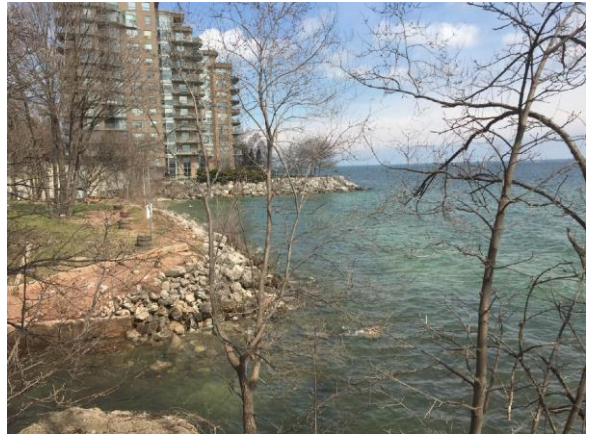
Reinforced banks along Lake Ontario shoreline facing northeast from mouth of Rambo Creek.
